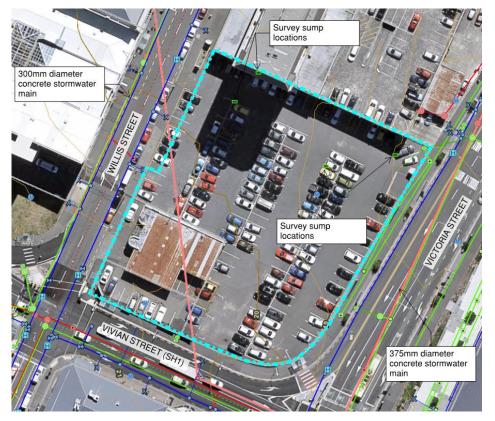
Stormwater Drainage Overview (Source: WCC GIS)
